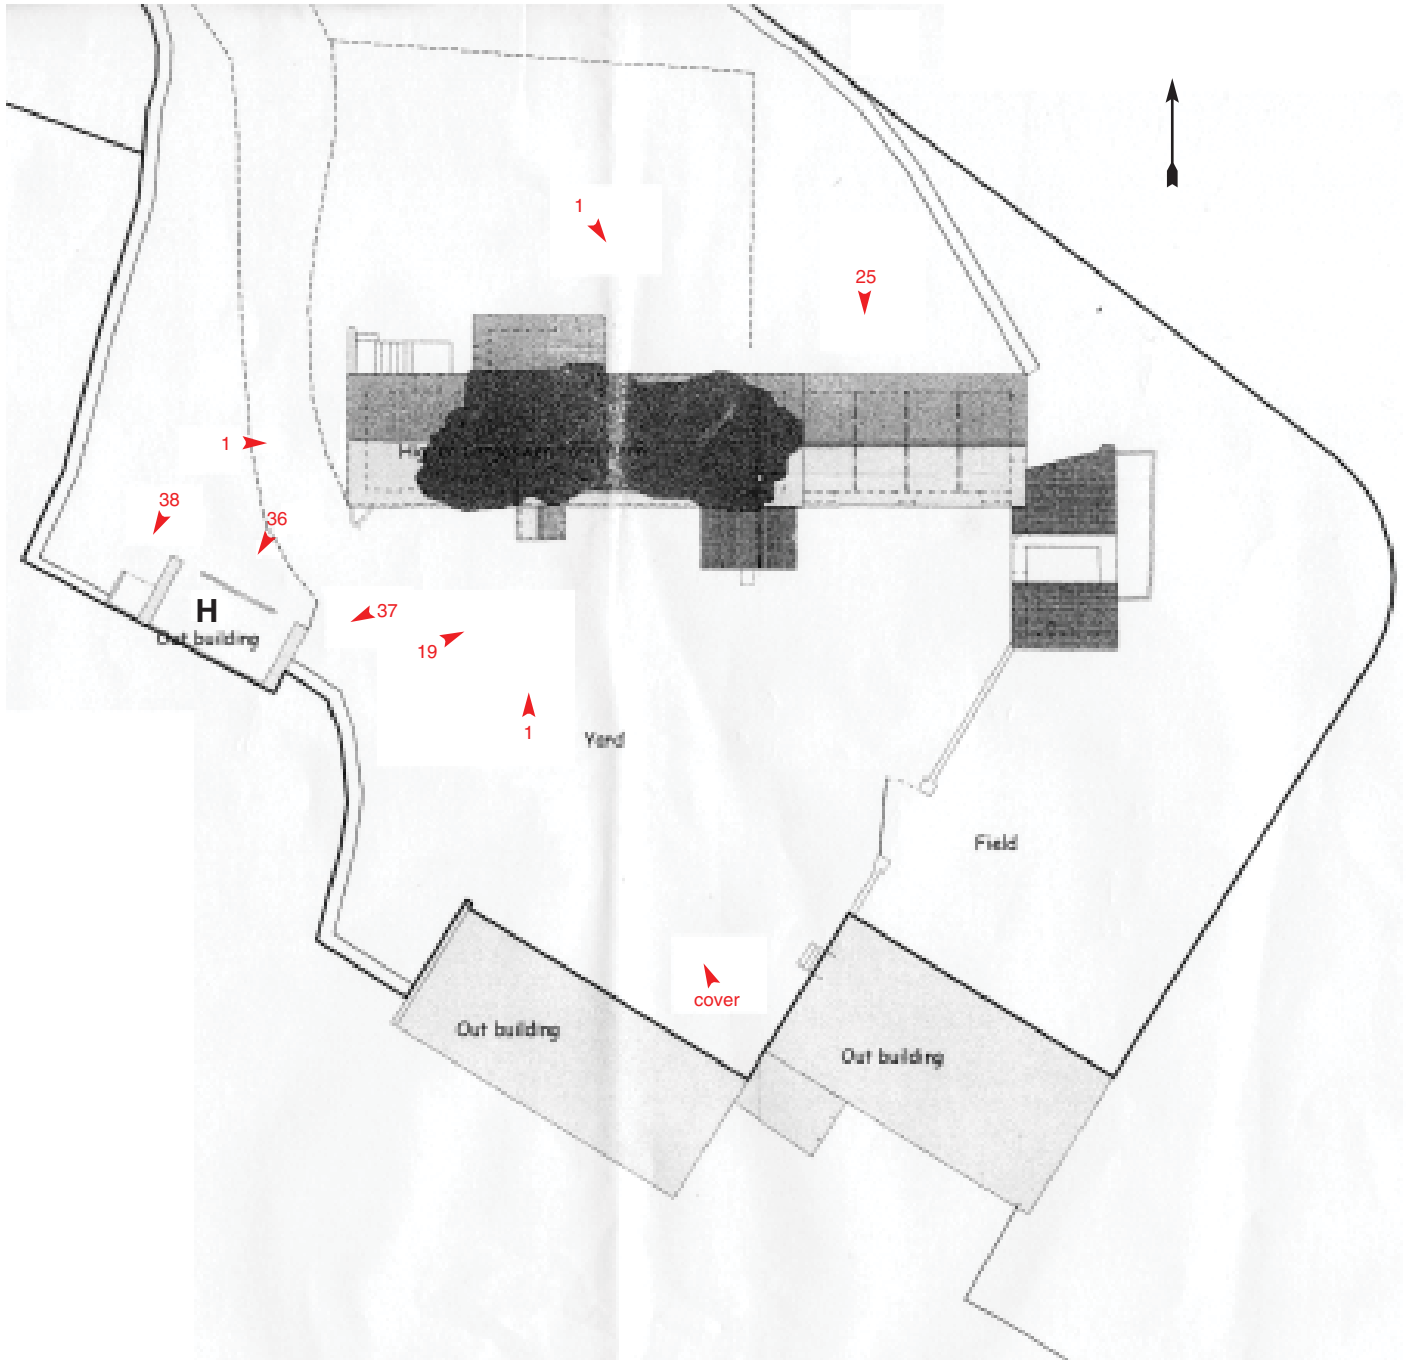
Plan showing building H referred to in the report and the location and direction of exterior photographs
